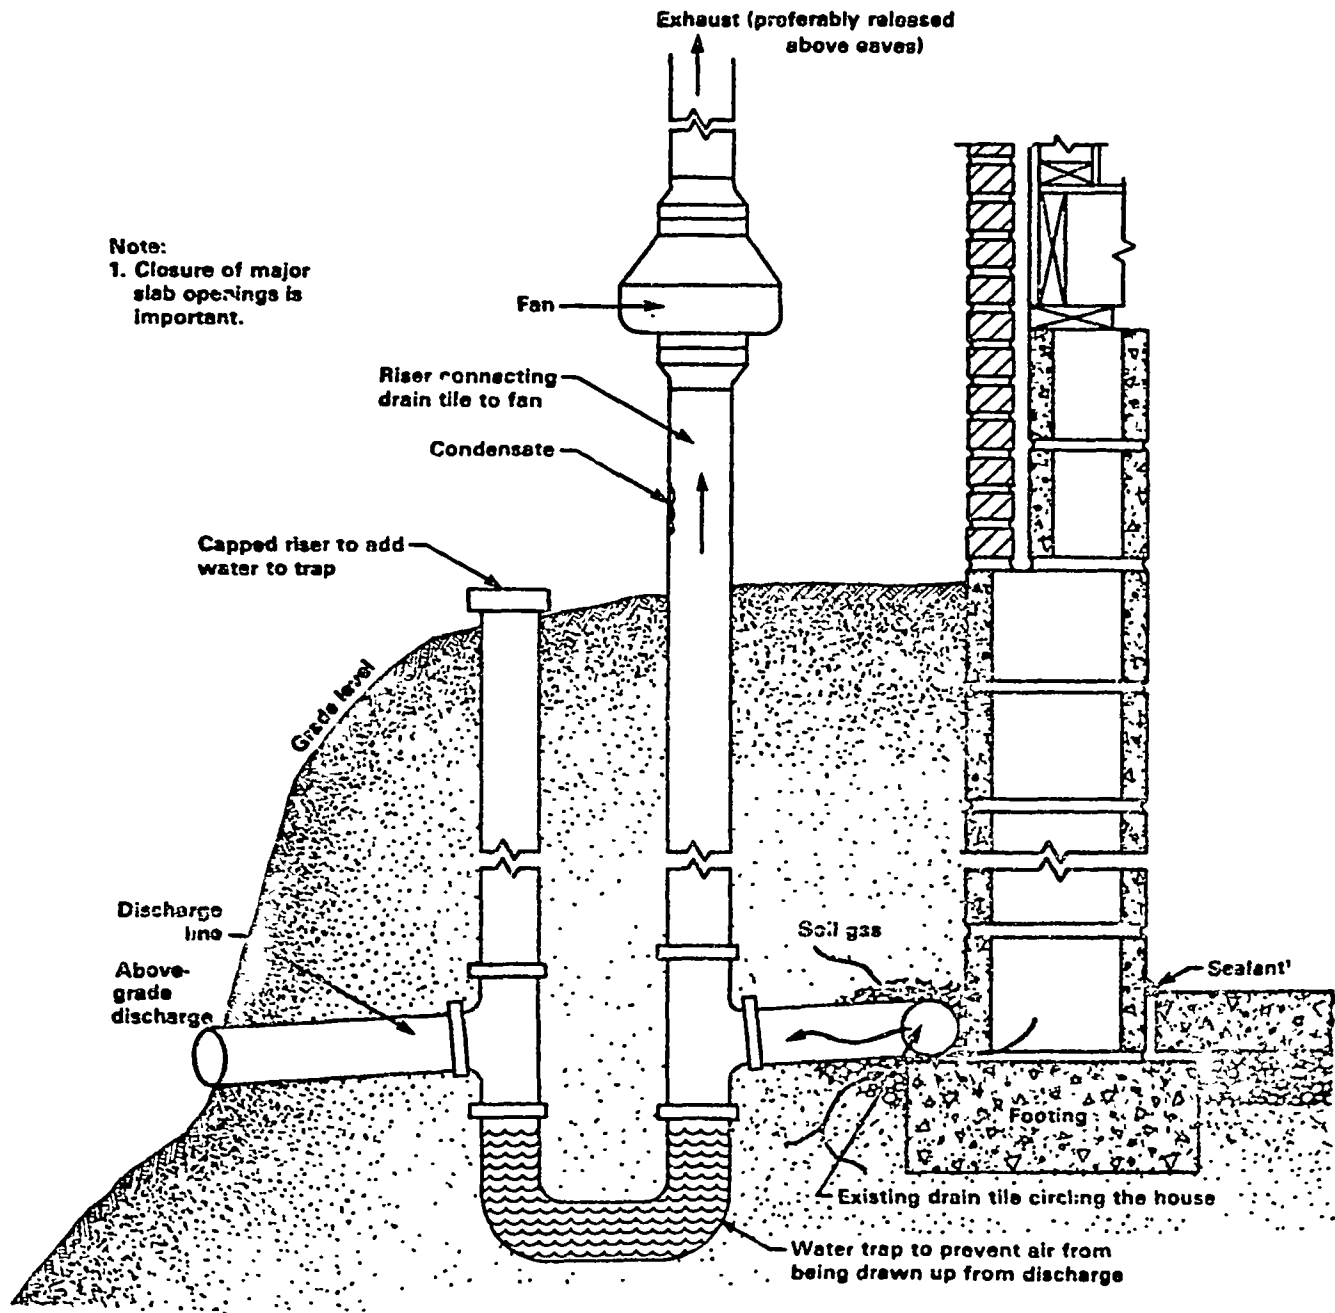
TYPICAL DRAIN TILE VENTILATION SYSTEM
